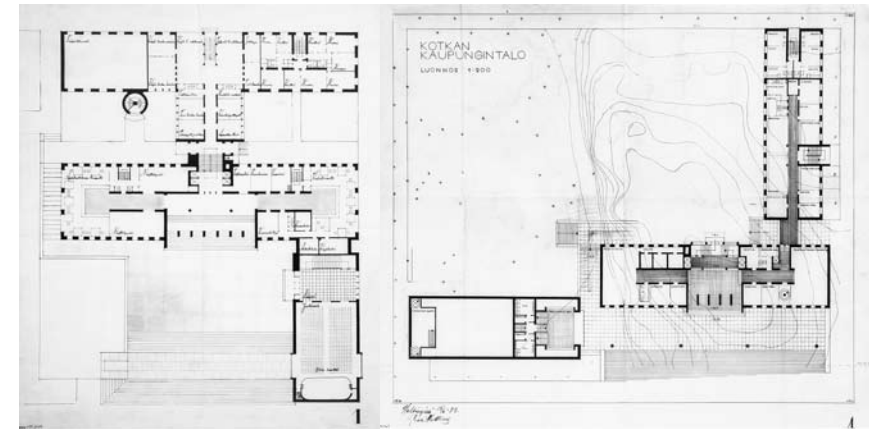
Erkki Huttunen, the revised competition project 1932 and a further revised version, 16.6.1932; plan ground floor (SRM).
